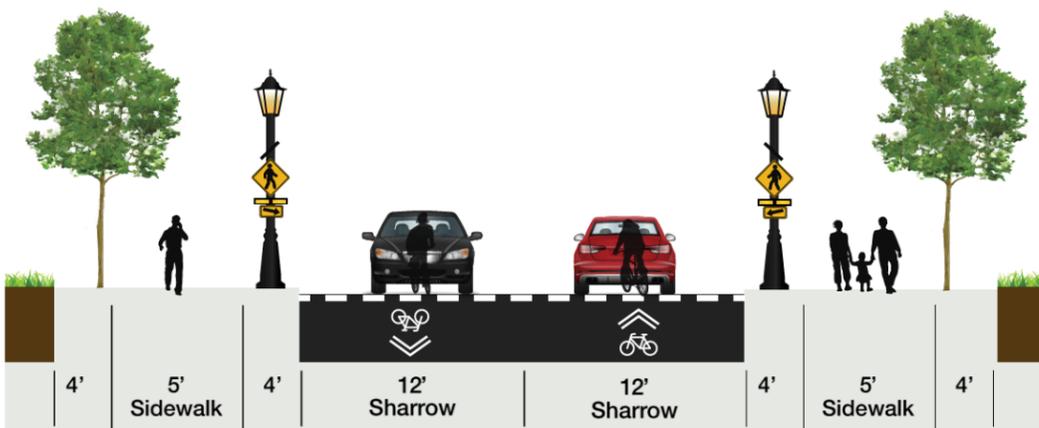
Pine Grove Road Cross-Section with Enhanced Pedestrian Crossing
